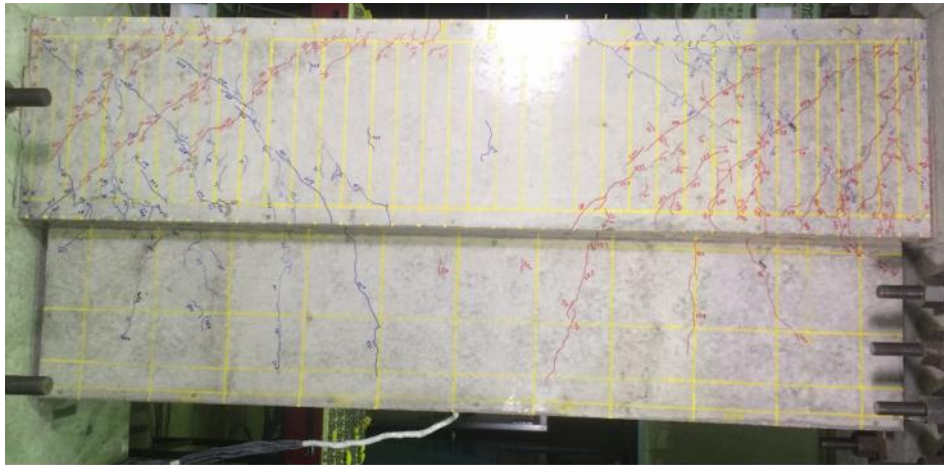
Extending the cracks to the wall at loading cycle of 1/100
